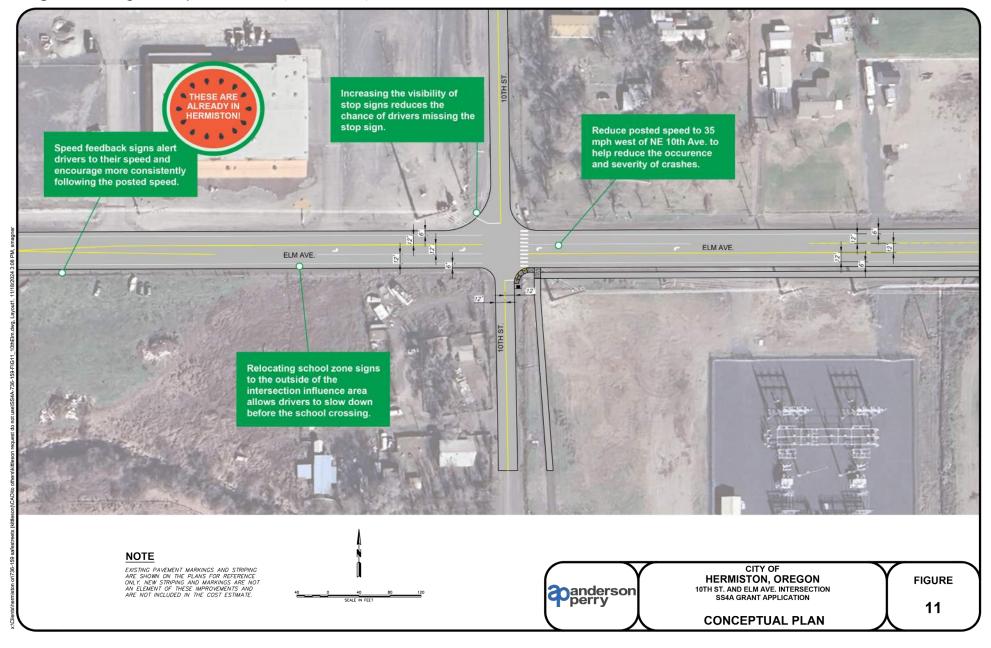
Design concept for OR 207 (Elm Avenue) and 10th Street
